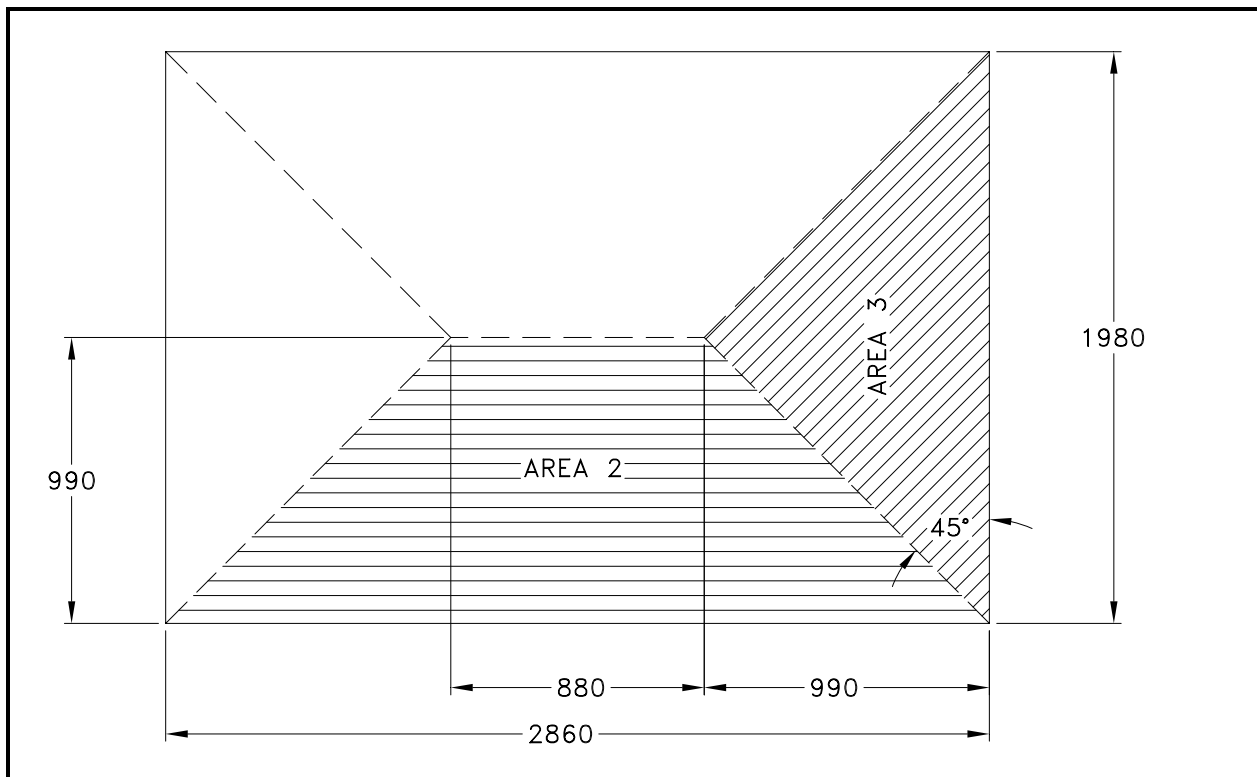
(d) – View of Areas 2 & 3 on Top Wall Used to Calculate Edge Loads on Side & Rear Walls
